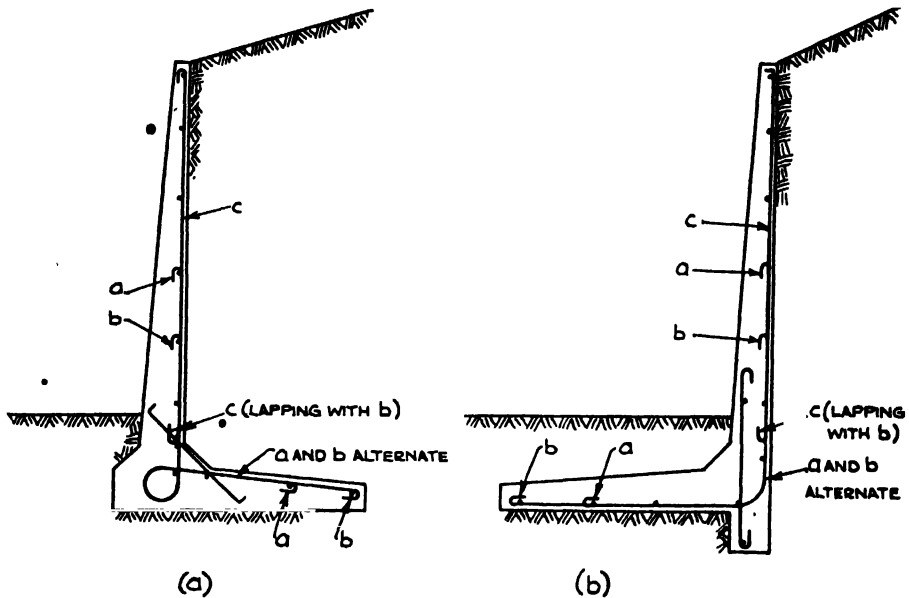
Typical Details of Simple Cantilever Retaining Walls.
